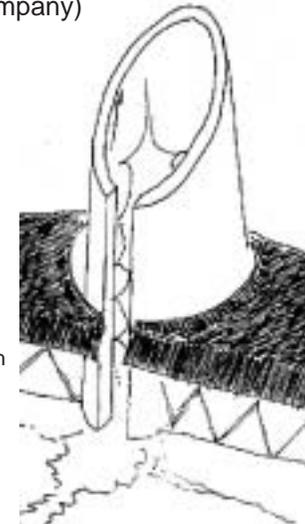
Centrally placed this rammed earth cone shaped tower could provide interesting challenges, pushing existing boundaries for earth wall construction.
